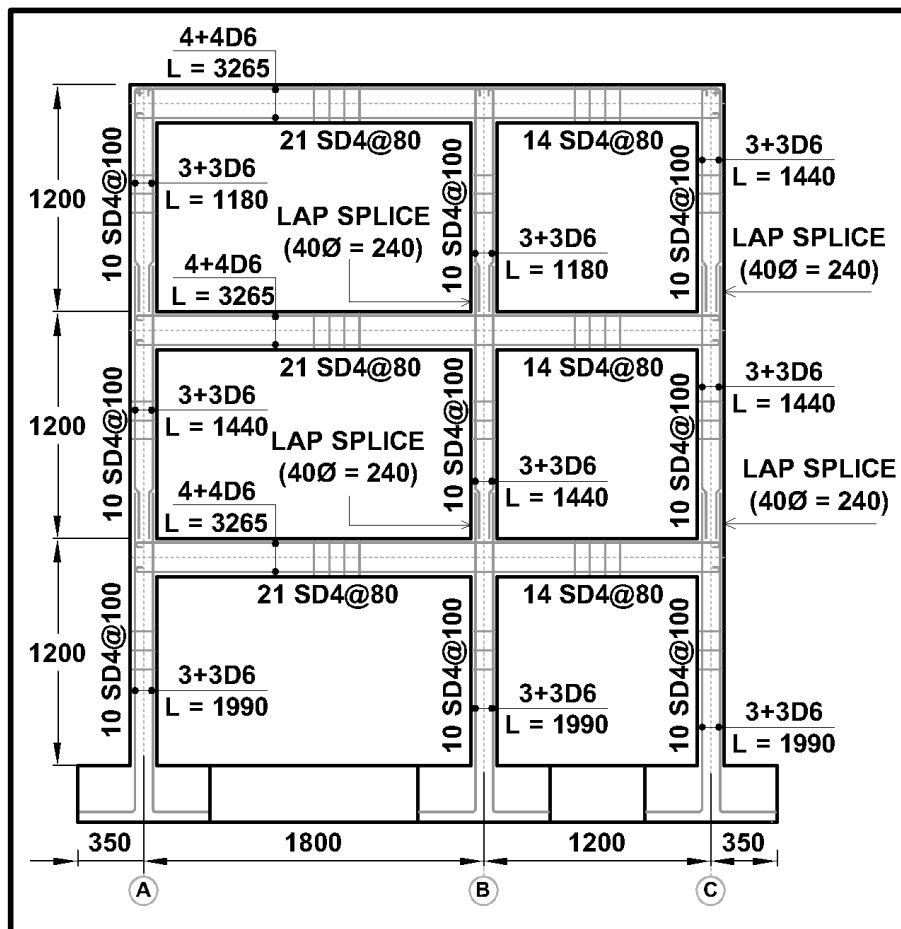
Reinforcement details, front view, axes 1 and 2.
